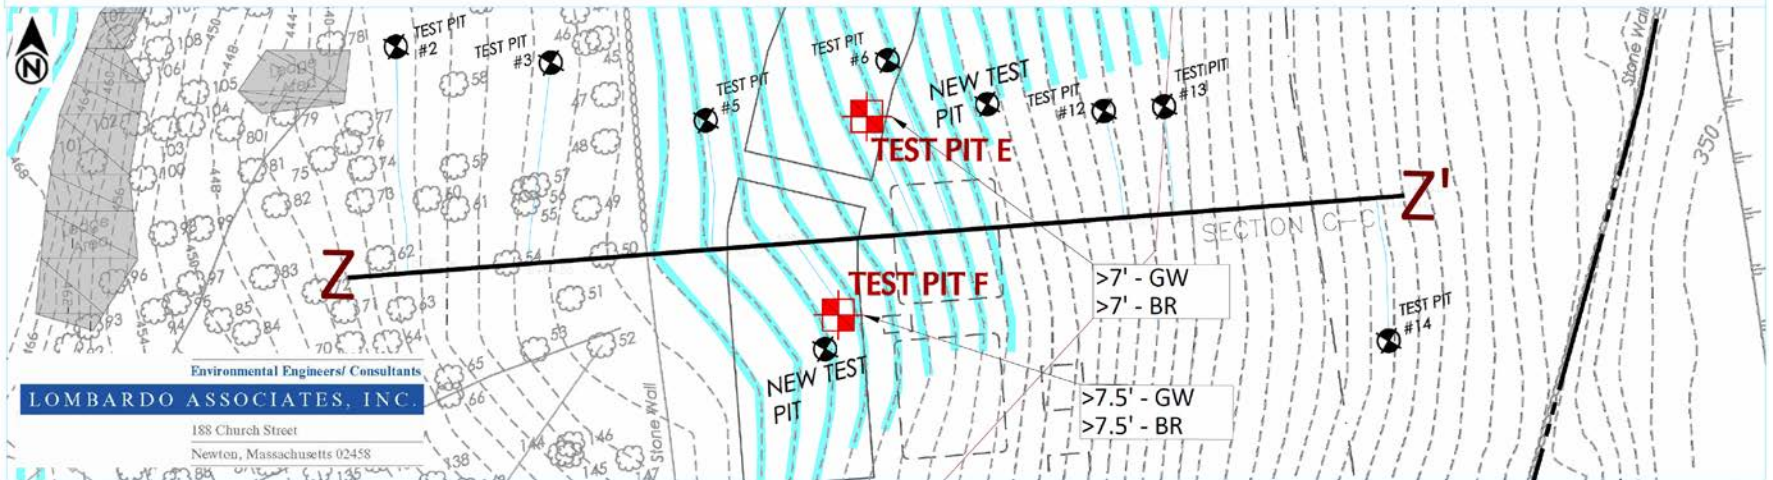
Lower Trinity Pass, South Test Pits Cross-Section
